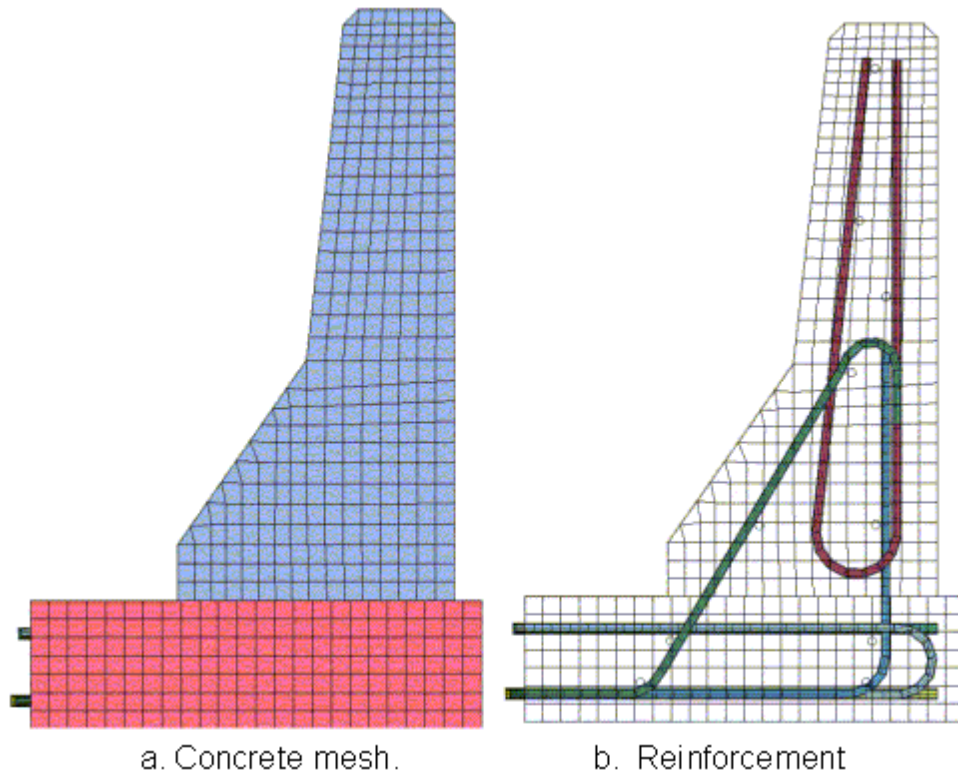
Concrete Mesh and Reinforcement (After Abu-Odeh, Bligh, & Yvonne, 2007)
